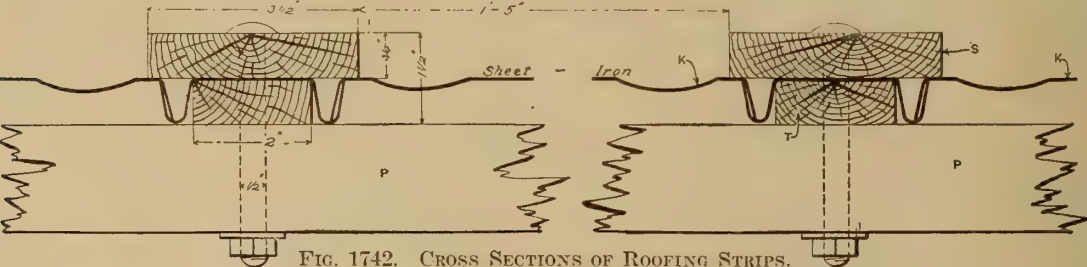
CROSS SECTIONS OF ROOFING STRIPS.
